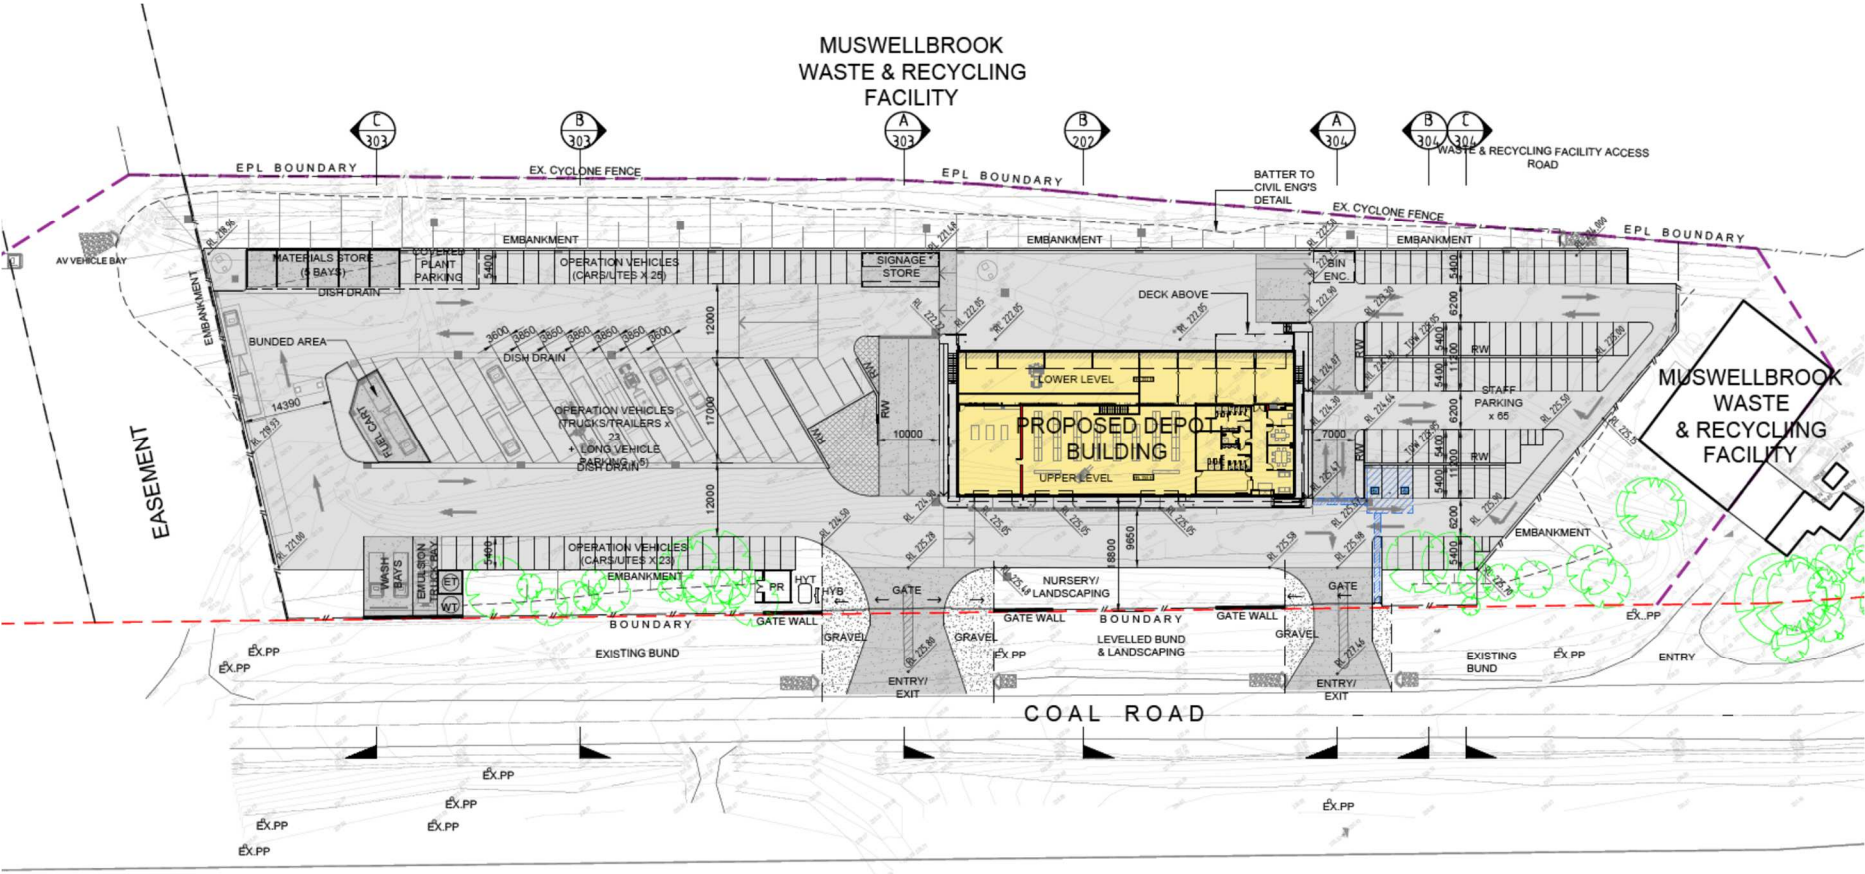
Site Plan of the proposed Community Infrastructure Depot.
